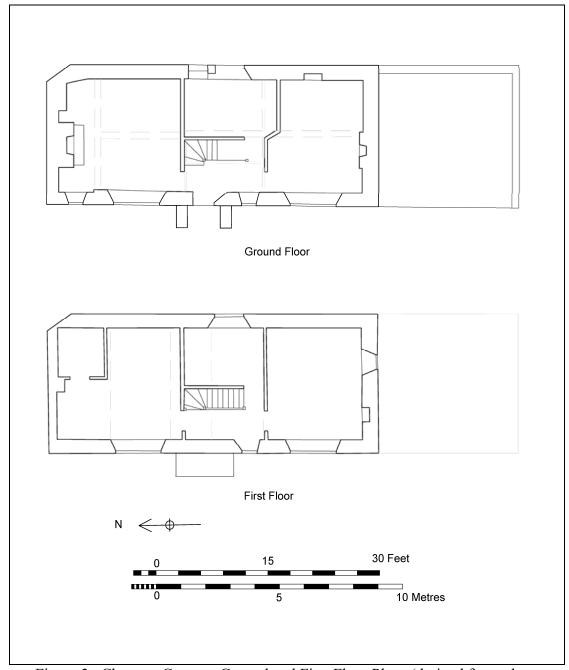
Chestnut Cottage, Ground and First Floor Plans (derived from plans supplied by FWK Architects).
